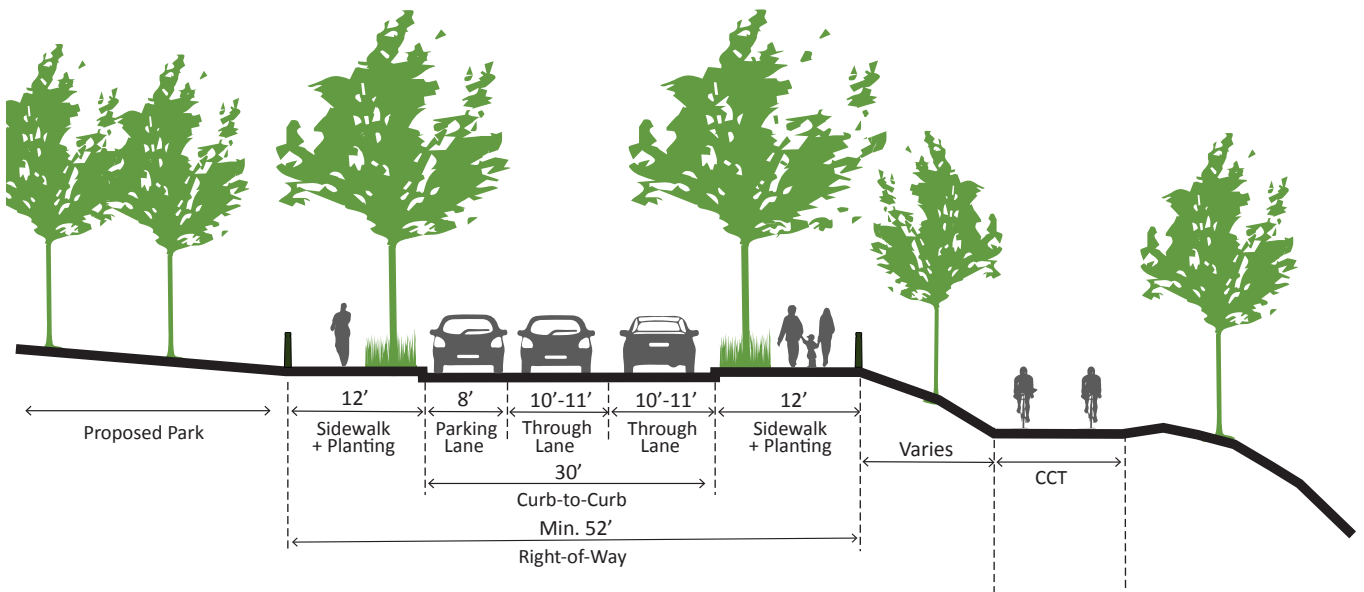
Proposed Connector Road Sections - between Westbard Avenue and River Road
